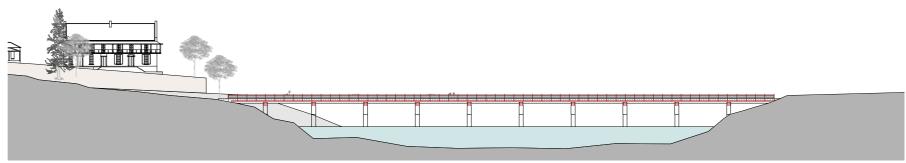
The existing Windsor bridge is a horizontal plane that articulates the low point in the topography.
